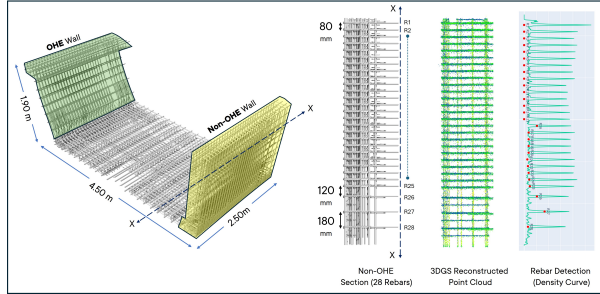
Overall process of rebar detection of non-OHE U-girder rebar cage.
